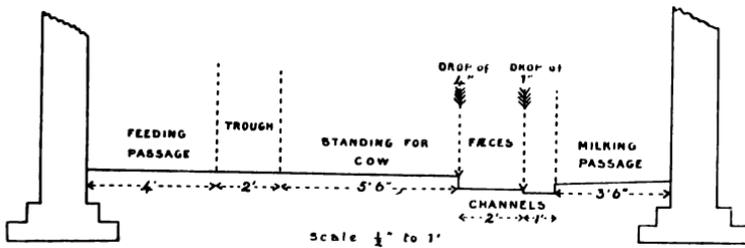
Arrangement of Cow-shed Floor as recommended by Lloyd.
